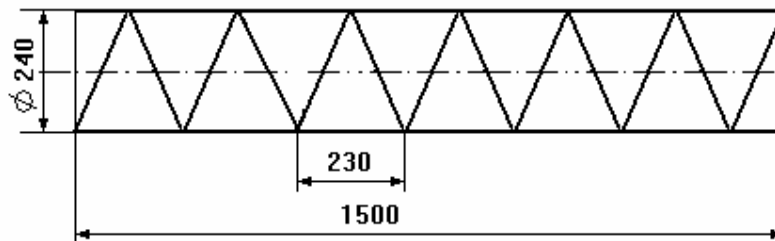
Inner fitting out made of helicoidally metallic tape scheme [6]
